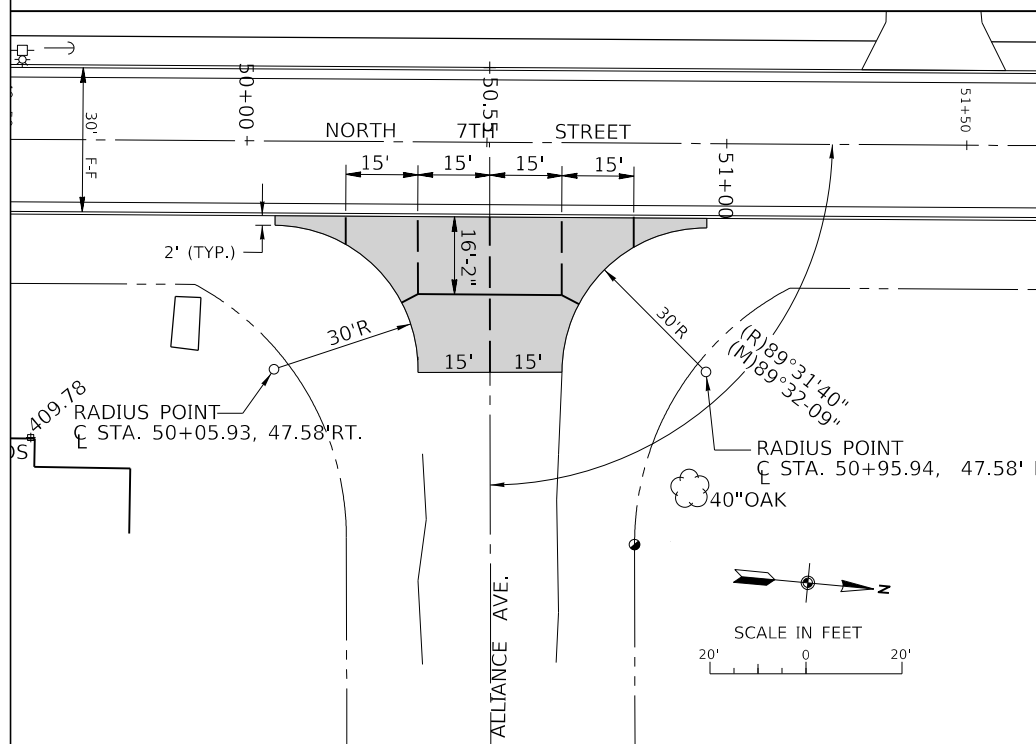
DETAIL OF CONSTRUCTION JOINT, SPECIAL
